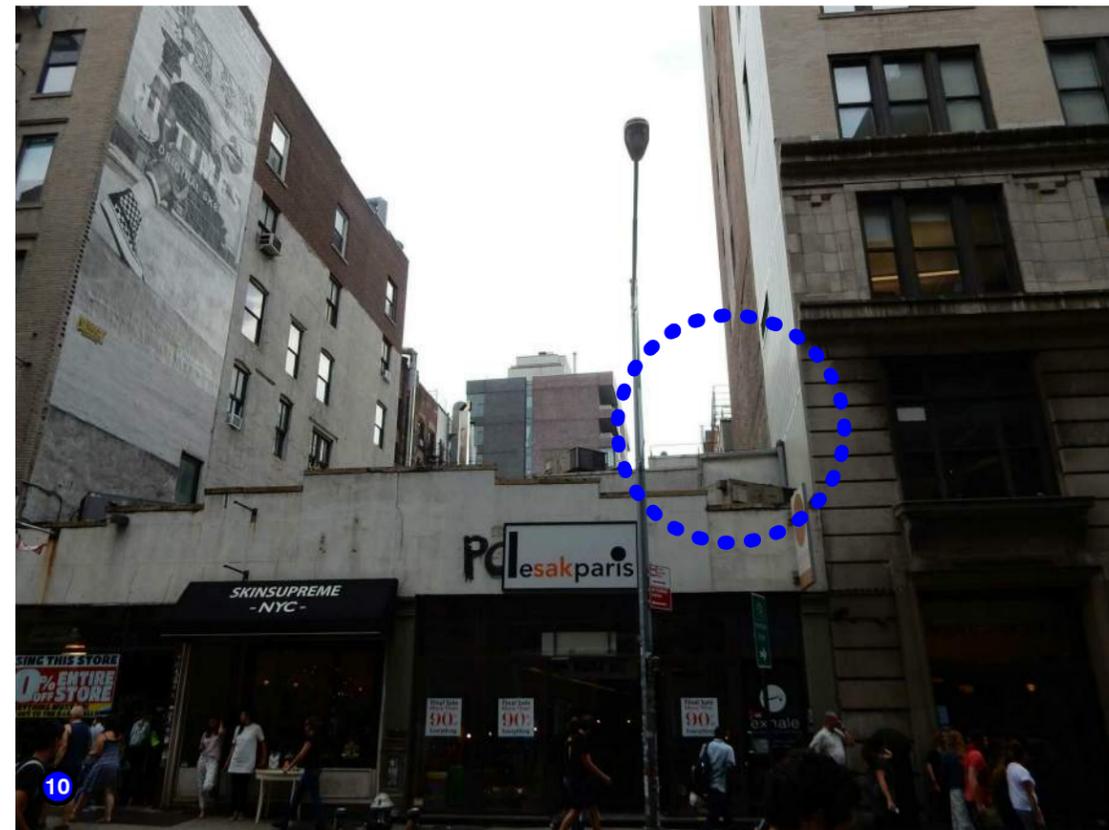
SPRING ST LKG S, ROOFTOP ADDITION BARELY VISIBLE (SECONDAY FACADE)
